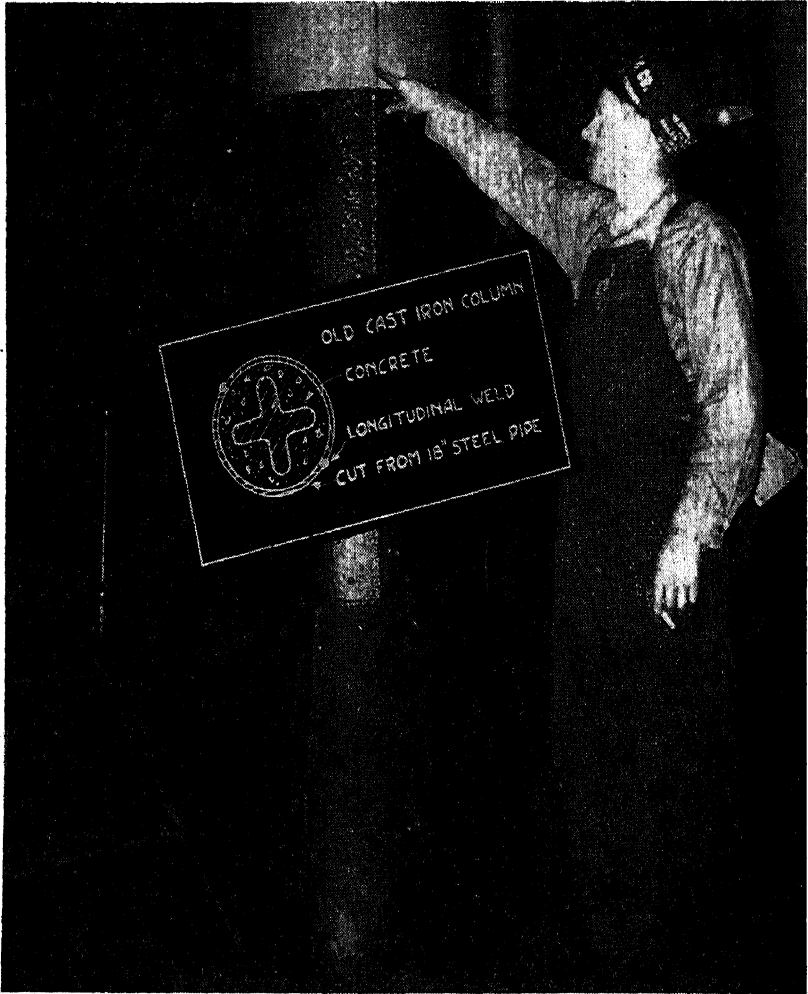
Main columns in a four-story brewery building of cast iron construction were reinforced by encircling with 18" steel pipe, split longitudinally and welded. Space between pipe and column was filled with concrete.
